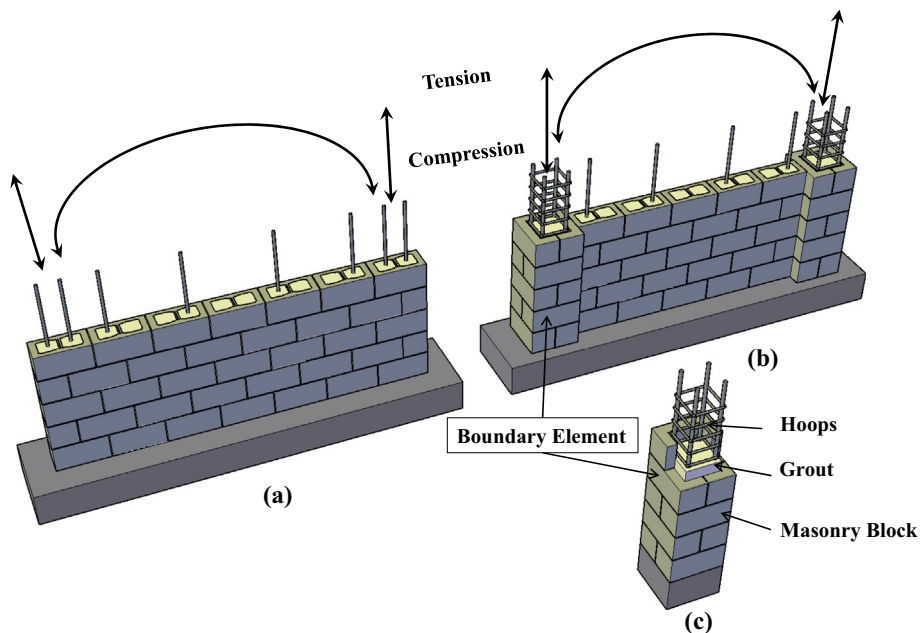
Schematics of a masonry building: (a) Rectangular RM wall; (b) RM wall connected with boundary elements; and (c) RM boundary element.
